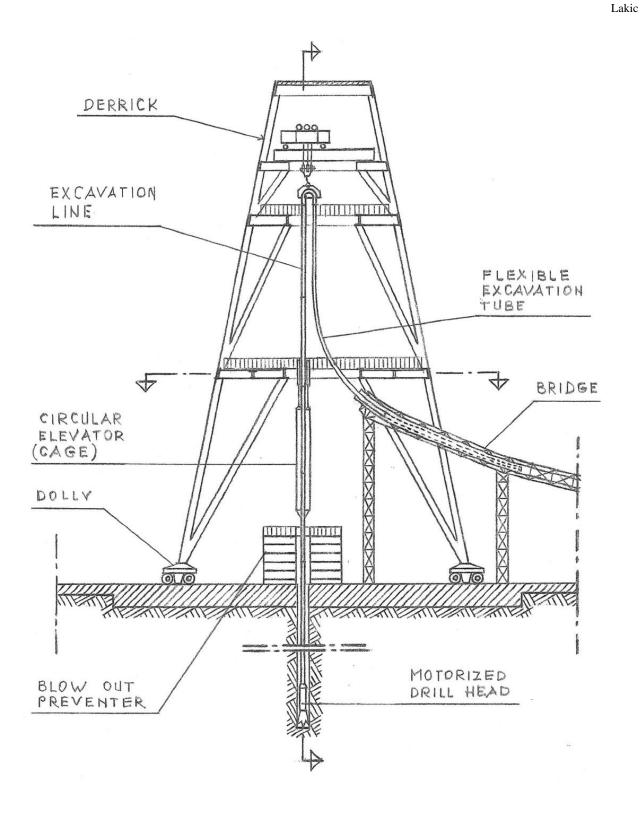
Another Schematic View of an Apparatus for Drilling Faster, Deeper, and Wider Wellbore with a Cage for Casing
